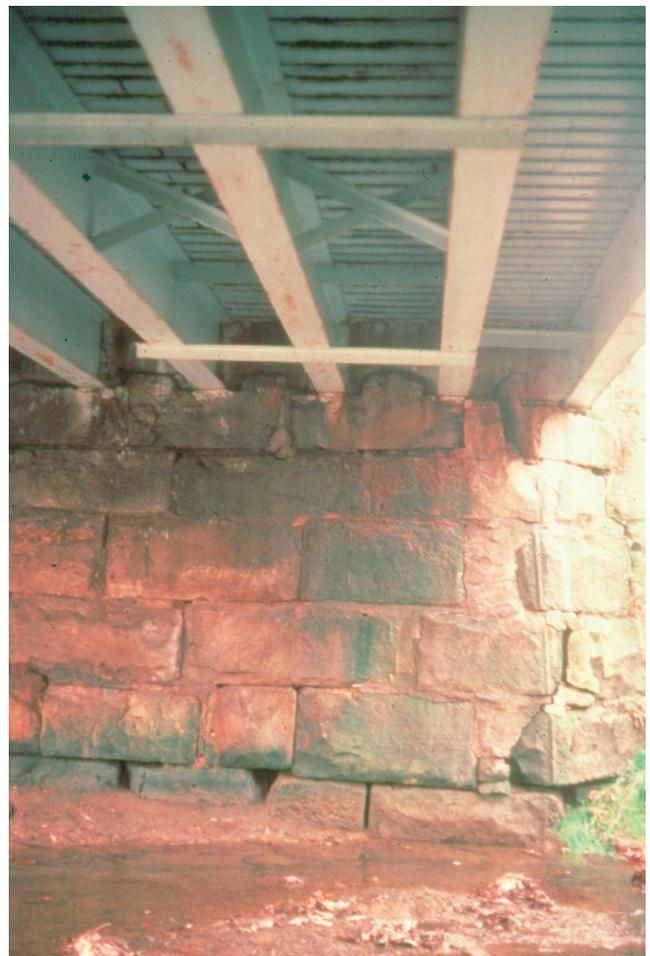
Deteriorated Stone Masonry Abutment
